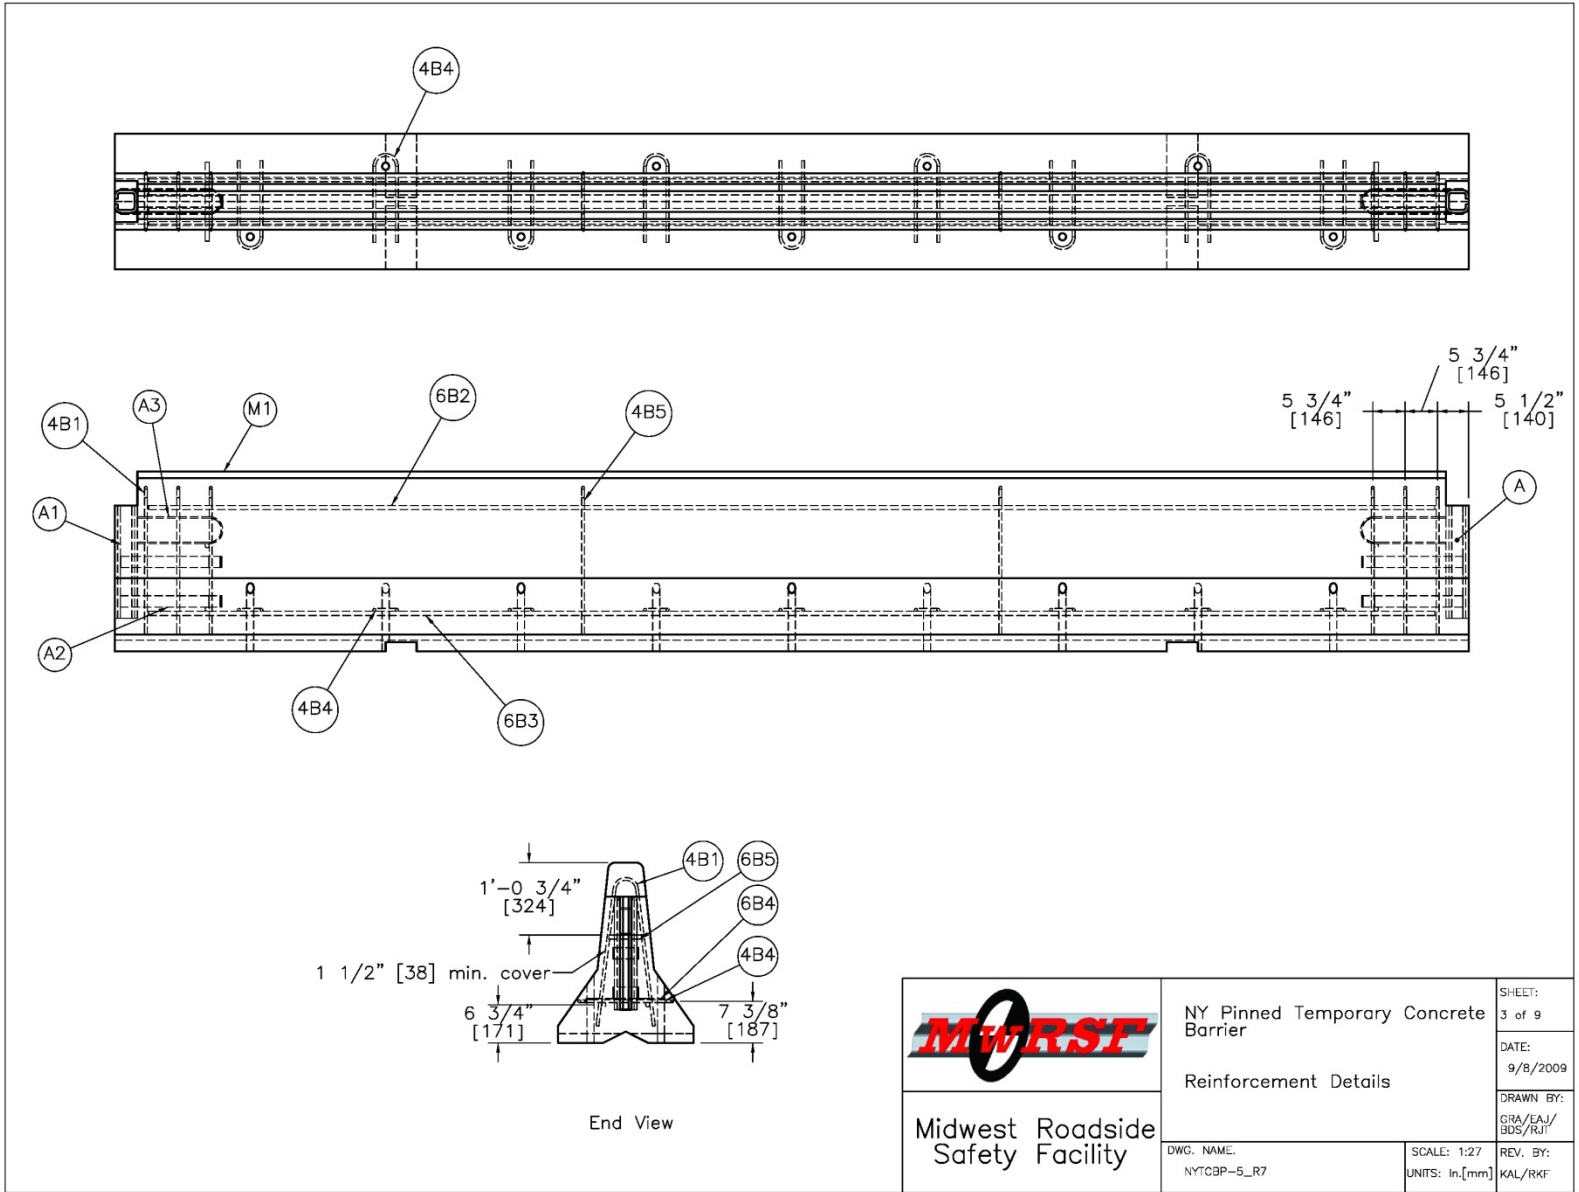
Temporary Concrete Barrier Reinforcement Details, Test No. NYTCB-5
